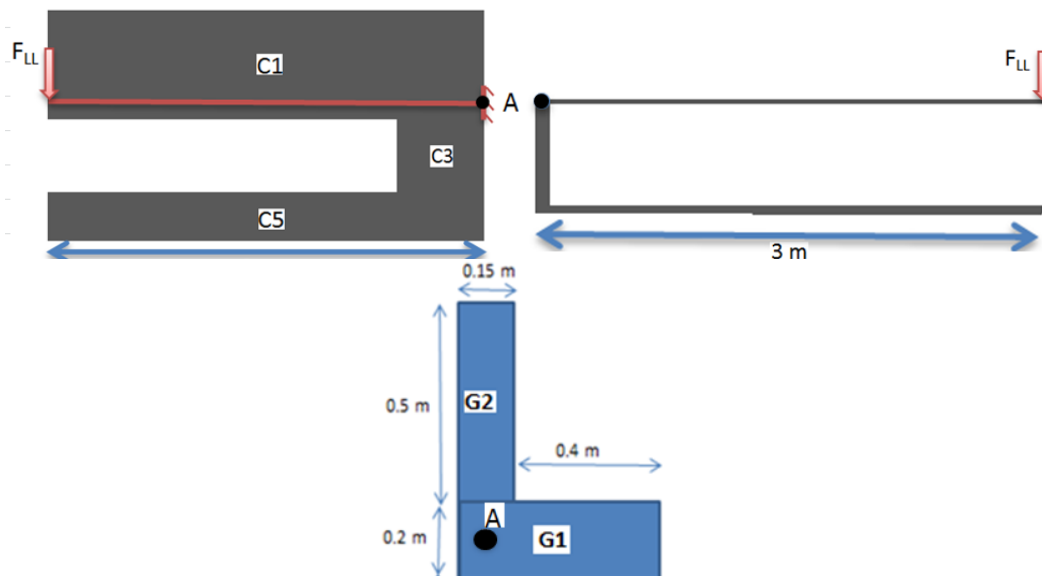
Longitudinal reinforcement calculation against bending in section C1
